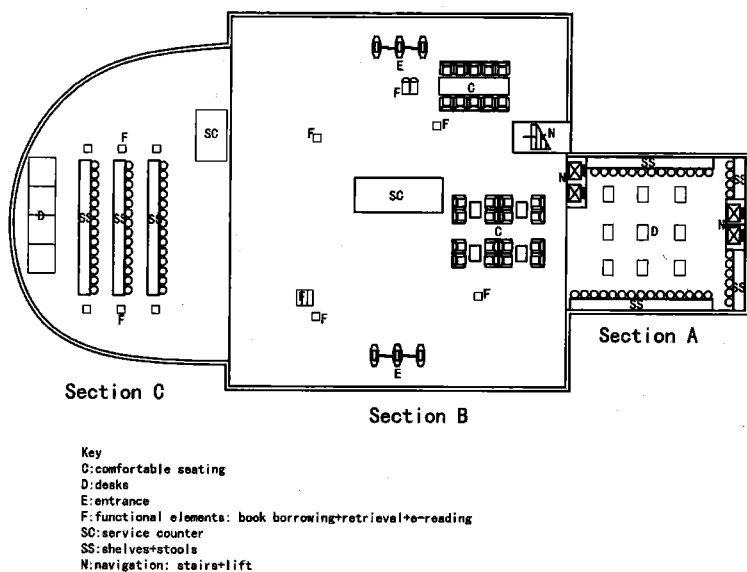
Floor plan “from above” (floors 1–5), approximate
